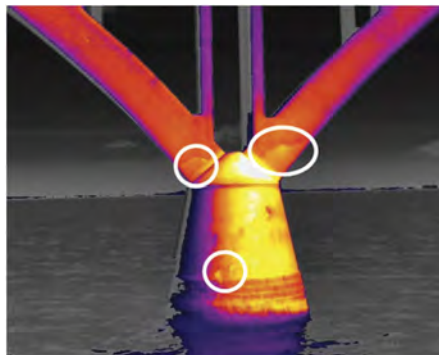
Thermography of potential delaminated areas on concrete bridge pier.
